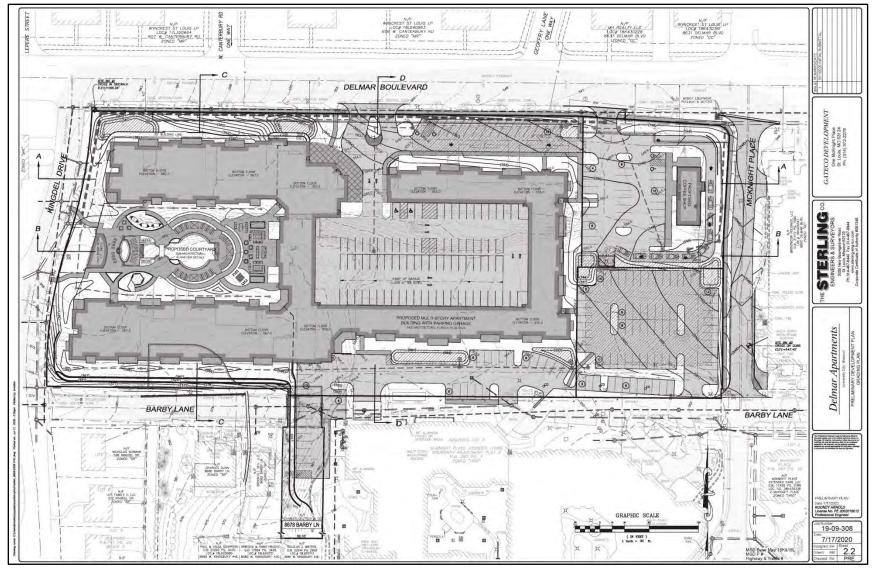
Delmar Mixed Use Site Plan (Provided by Others)
